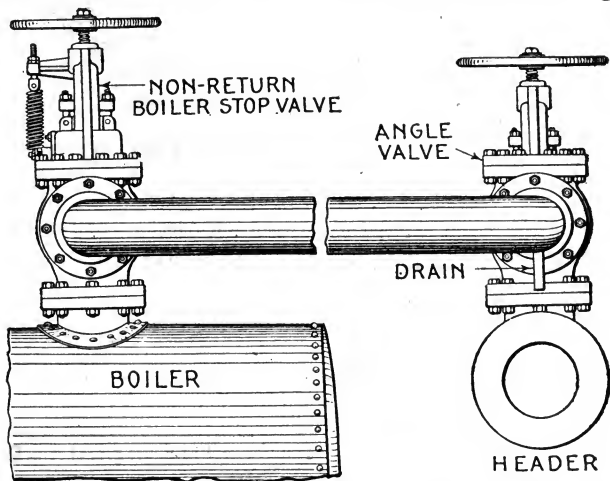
,134.—Method of connecting a header to a battery of boilers. Where two or more boilers are connected to a single header, the use of a reliable non-return boiler stop valve is necessary, and in some countries their installation is compulsory. A non-return boiler stop valve will instantly close should the pressure in the boiler to which it is attached suddenly decrease below that in the header, and thereby prevent the entrance of steam from the other boilers of the battery. This sudden decrease in pressure may be caused by a ruptured fitting or the blowing out of a tube, in which event an ordinary stop valve taking the place of a non-return boiler stop valve would be inadequate, as the loss of steam from the other boilers of the battery would be tremendous before an ordinary valve could be reached and closed, assuming that it would be possible to do so, which in the majority of cases it would not. Should it be desired to cut out a boiler for cleaning or repairs, the non-return boiler stop valve will not permit steam to enter the boiler from the header, even should the hand-wheel be operated for this purpose, as it cannot be opened by hand, but can, however, be closed. A non-return boiler stop valve should be attached to each boiler and connected to an angle valve on the header. A pipe bend should be used for connecting the valves, as this will allow for expansion and contraction. The pipe should slope a trifle downward toward the header and a suitable drain provided. This drain should be opened and all water permitted to escape before the angle valve is opened, thereby preventing any damage due to water hammer.
